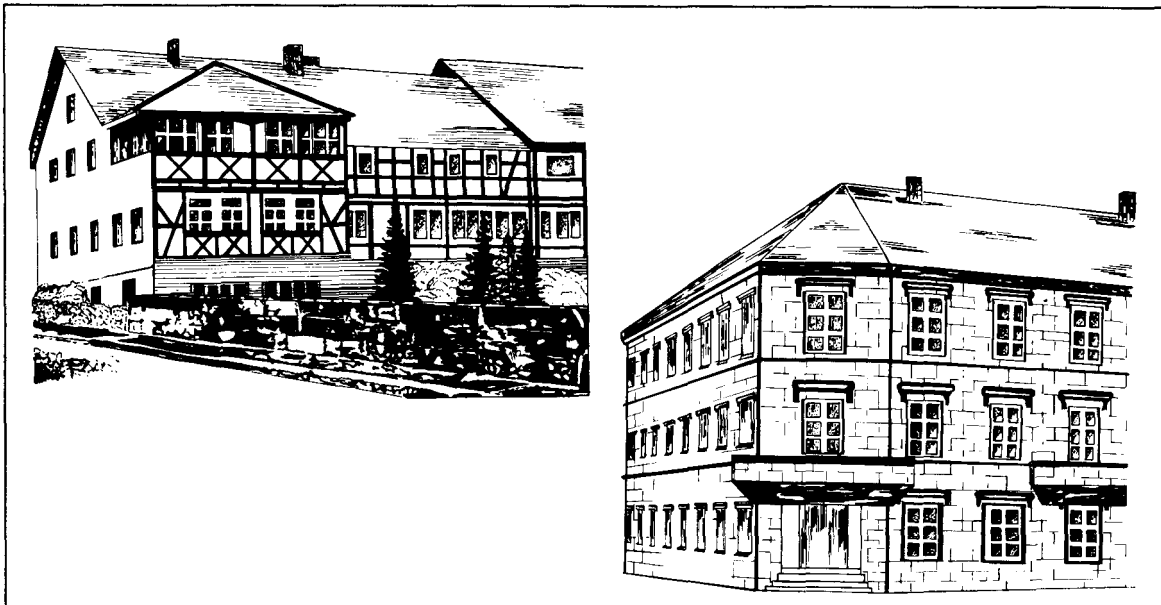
Examples of construction/building type (wood and frame and masonry)
